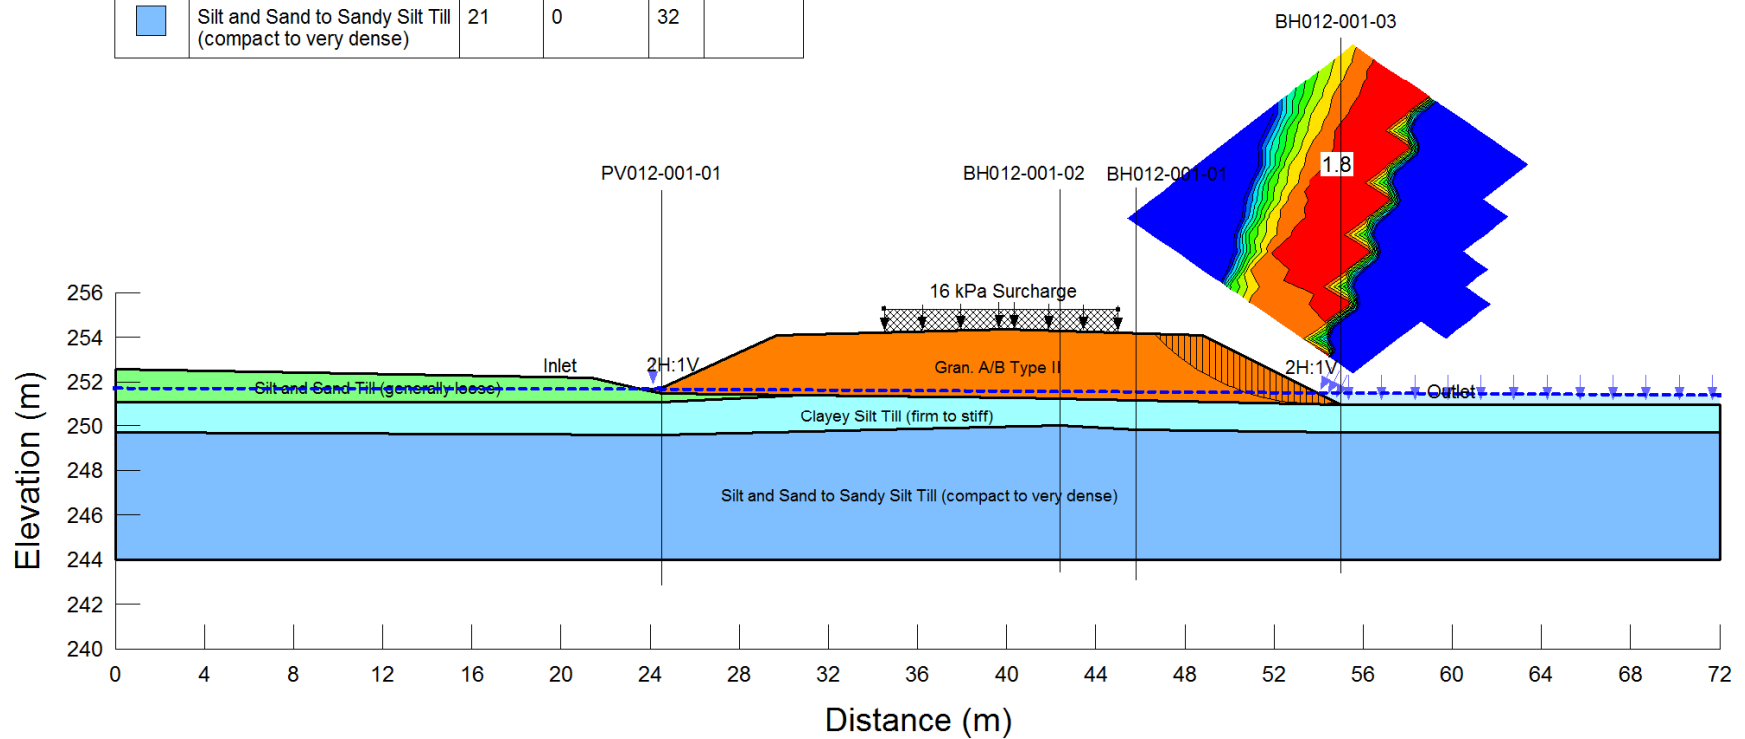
Slope stability analysis for outlet side of new embankment reconstructed w/ Granular A/B Type II (2H:1V) – undrained static condition
